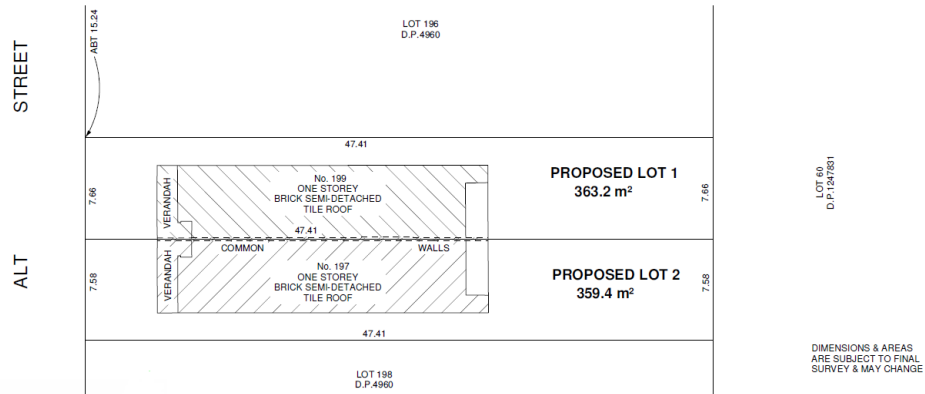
Plan of Subdivision, Sydney Surveyors 28/03/2034
